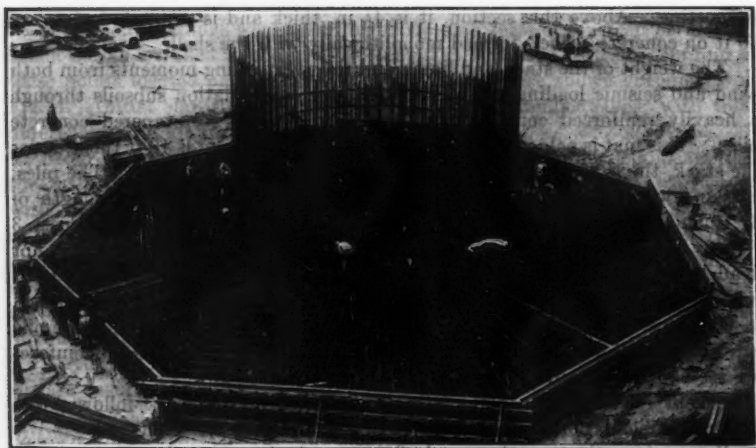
REINFORCING FOR STACK FOUNDATION
